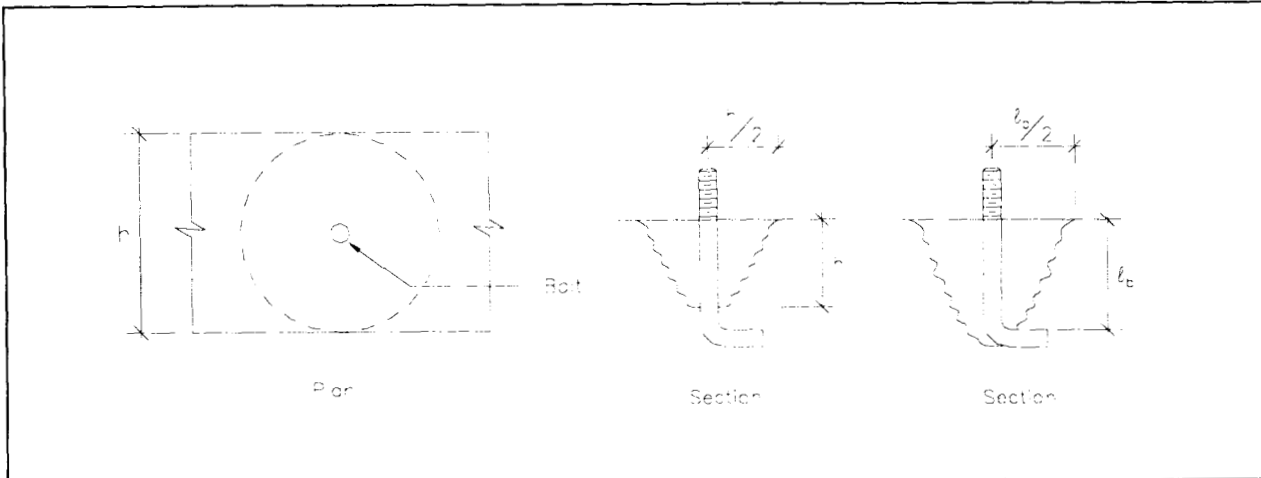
Assumed Cone Shear Failure Surface for Bolted Sill Plate Roof Connection
